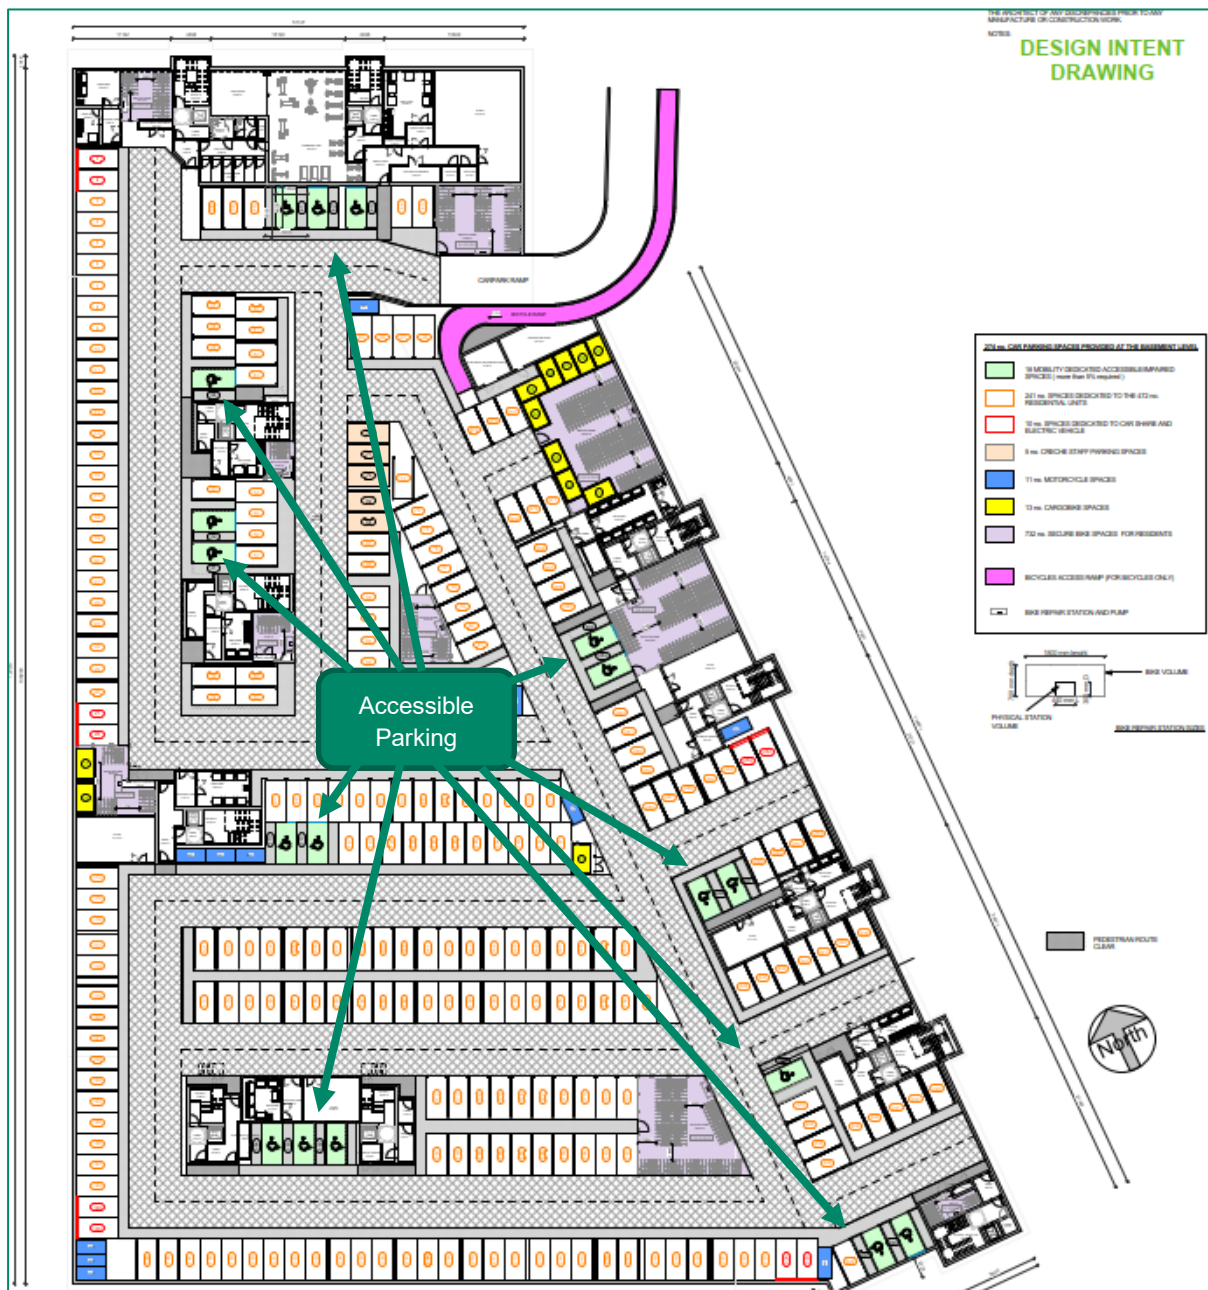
Accessible Parking Basement Layout (Source: C+W O'Brien Architects Drawing No. 092035)
